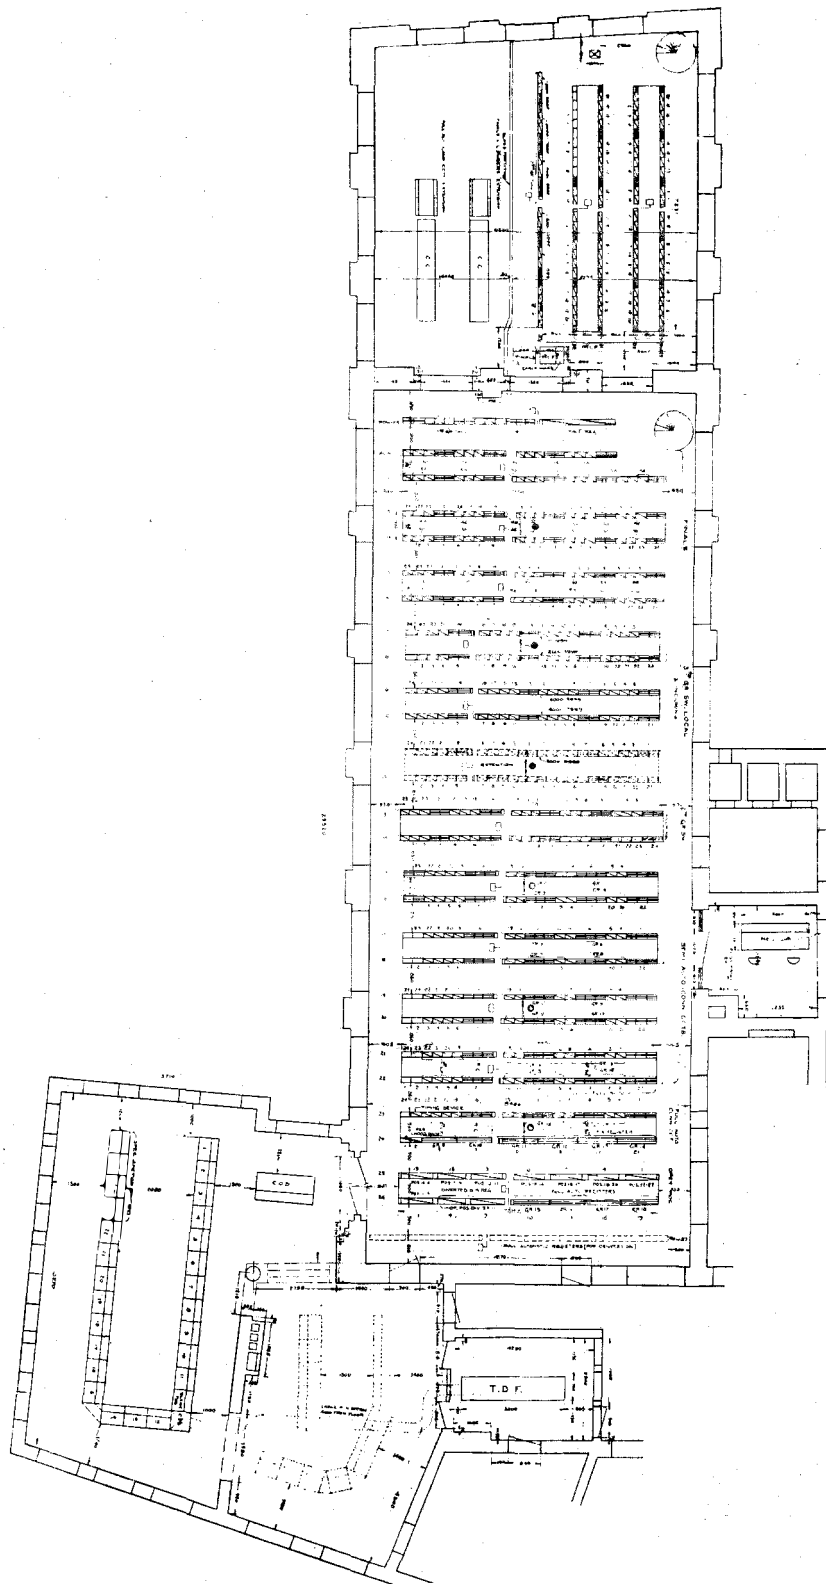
Centrum Exchange Floor Plan, Automatic Switch Room
